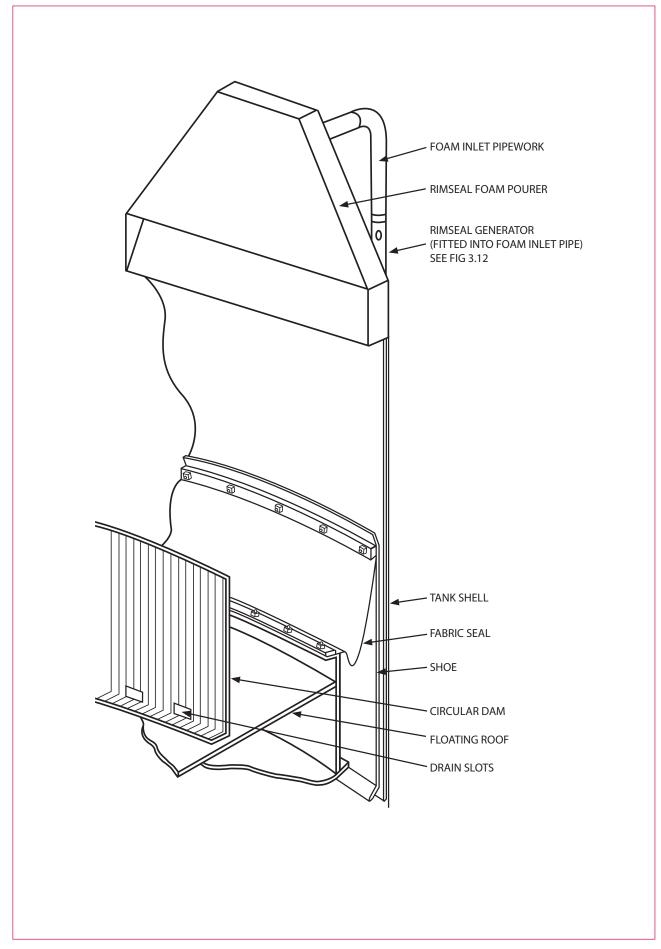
Typical Foam Dam arrangement for Open Top Floating Roof Tank, showing Rimseal Area, Pourer, Seal & Foam Dam
